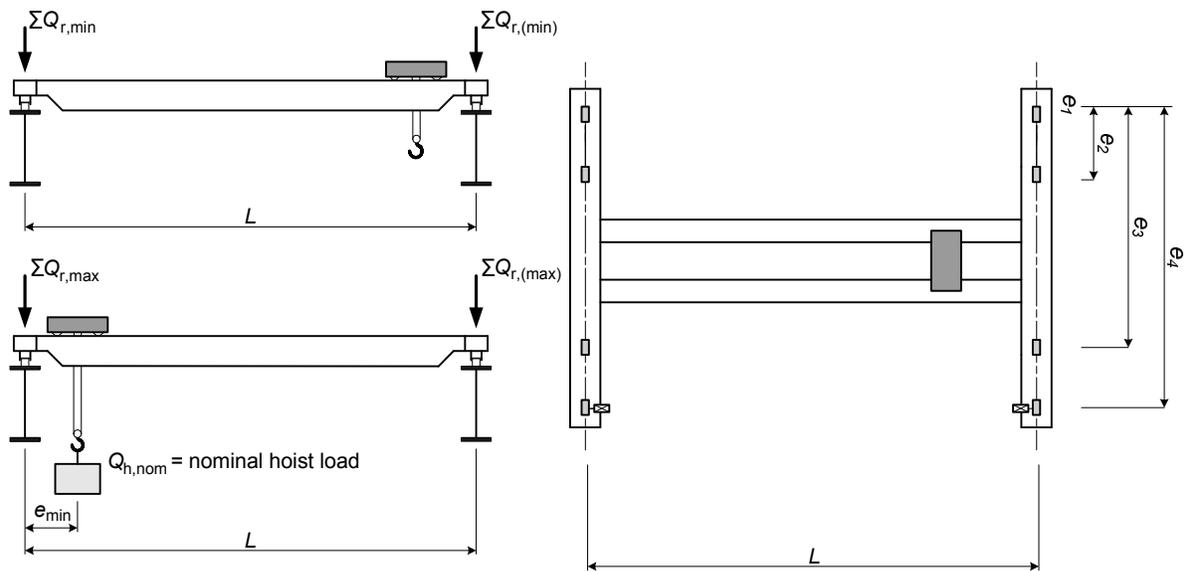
Proposed wheel configuration of an 8 wheel crane
